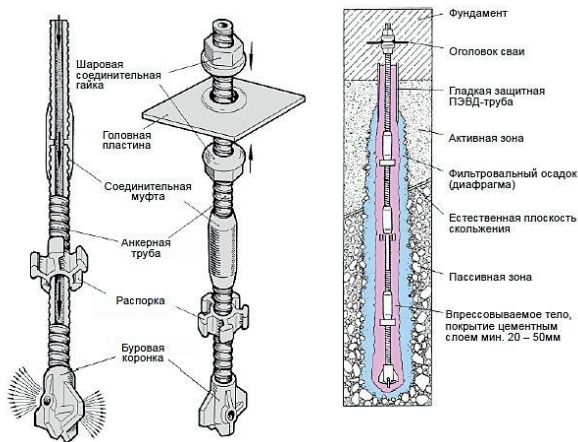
Structural elements of Titan cylindrical (anchor) bored injection pile (Germany)
